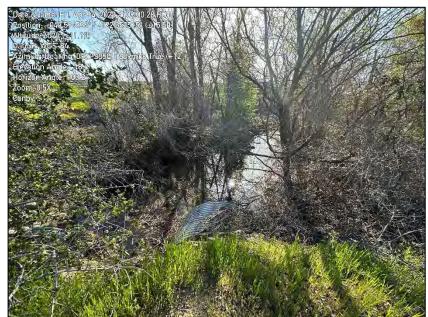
Showing where the onsite intermittent drainage daylights on the eastside of Canby Road.
